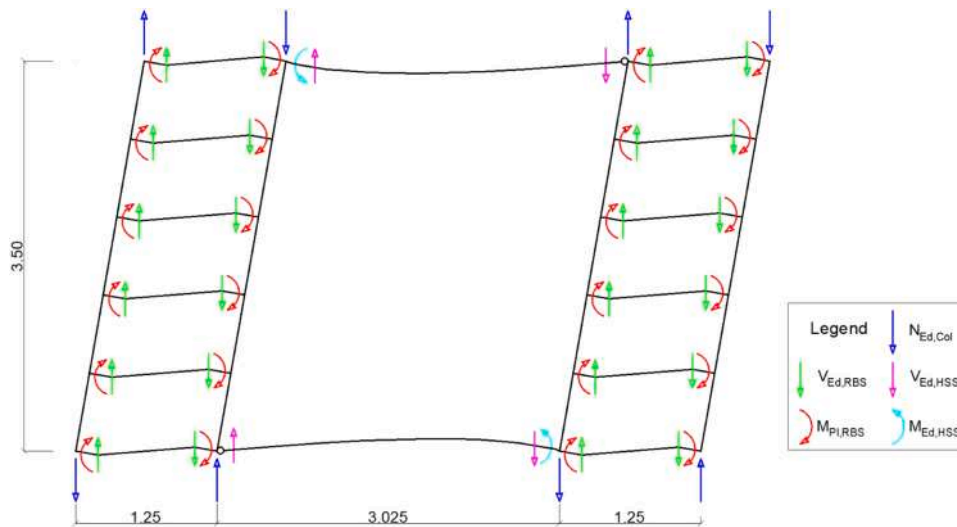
Lateral-resisting mechanism. Dimension in meters.
